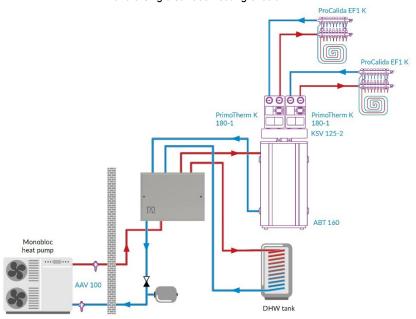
AMB 900 hydraulic module used in a system with a monobloc heat pump and two surface heating circuits
